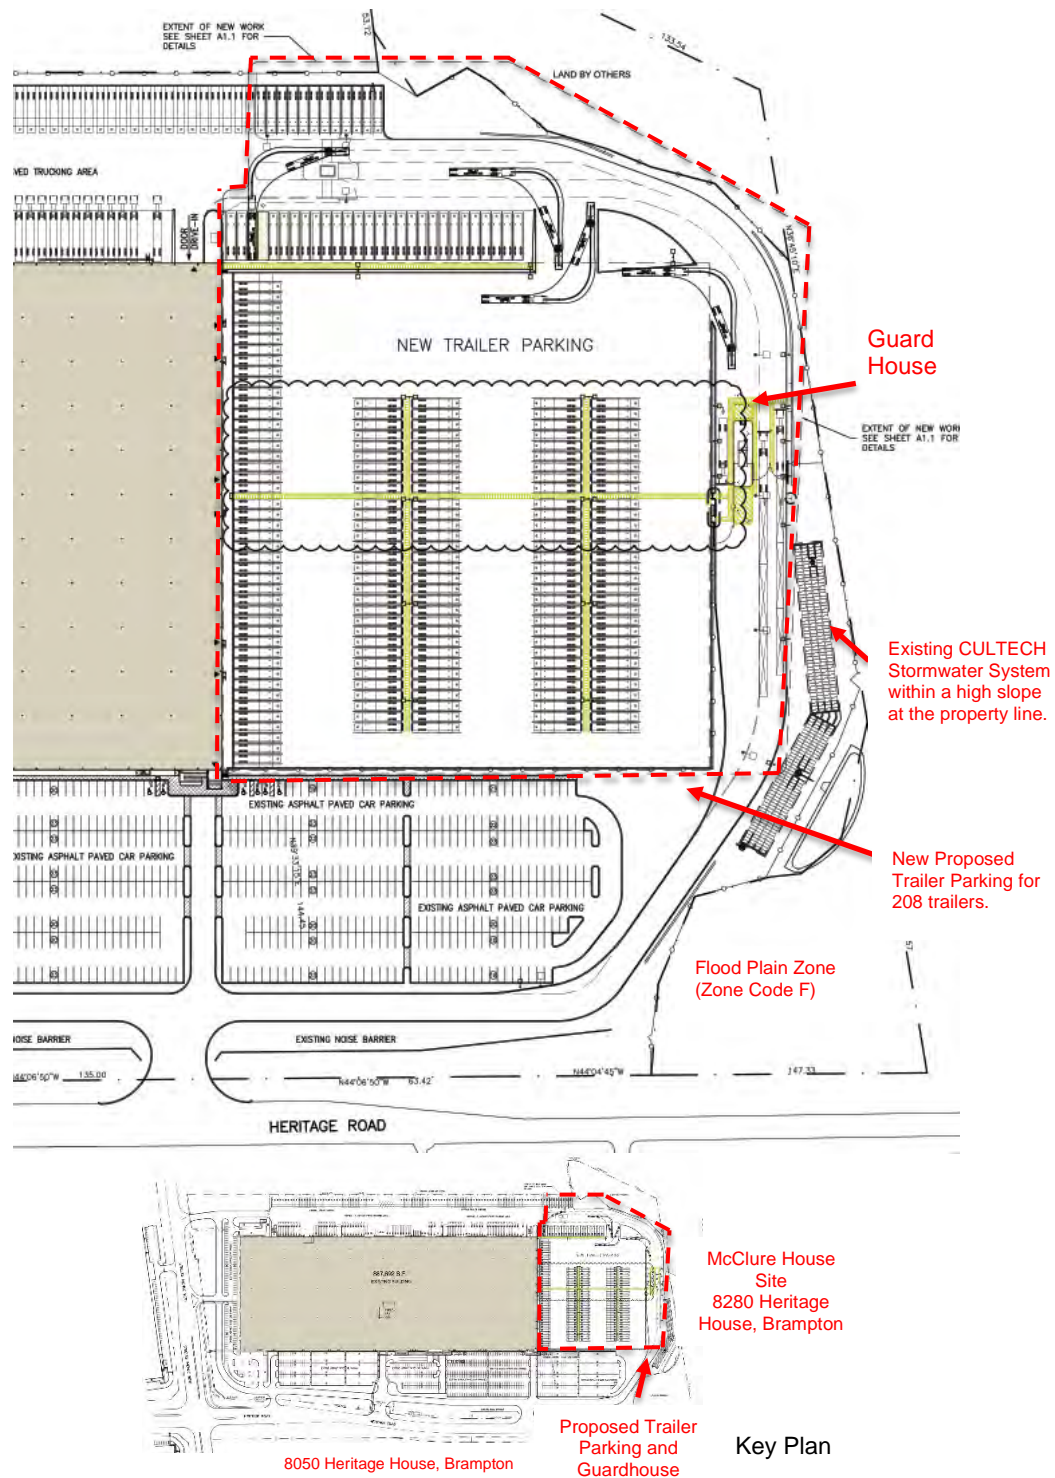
Proposed Site Plan of the new proposed trailer parking and guardhouse
